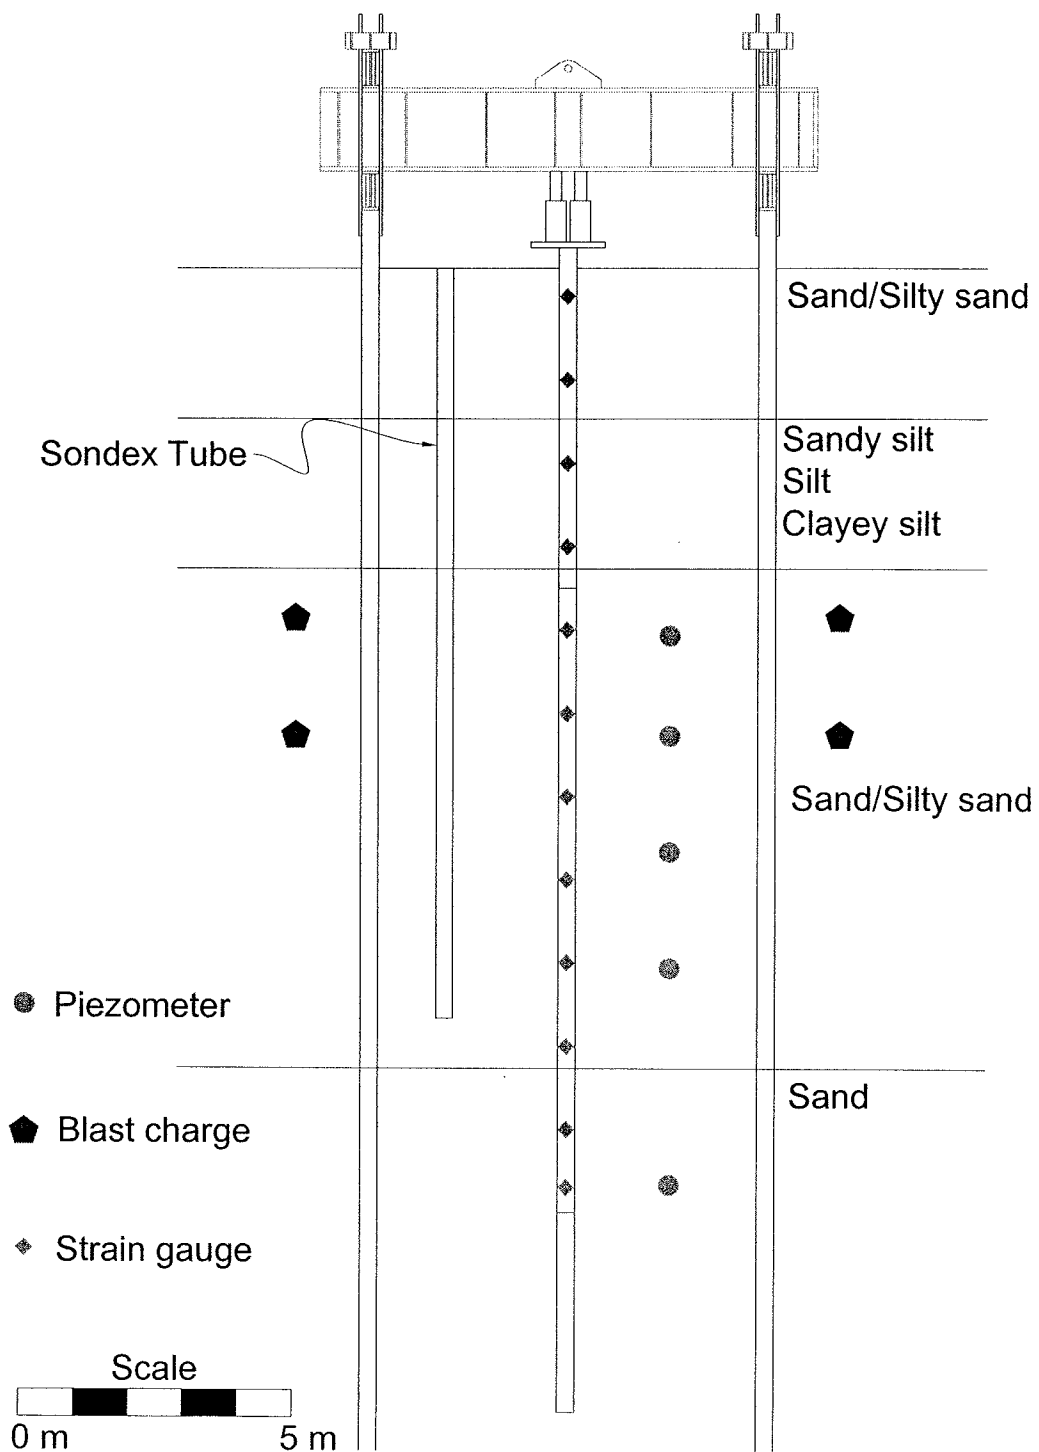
Profile view of pile foundation and instrumentation layout at Site 3.
